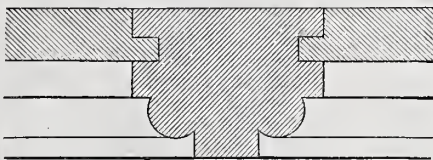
Horizontal Section on the Line a b, Front Gable, Fig. 9.
